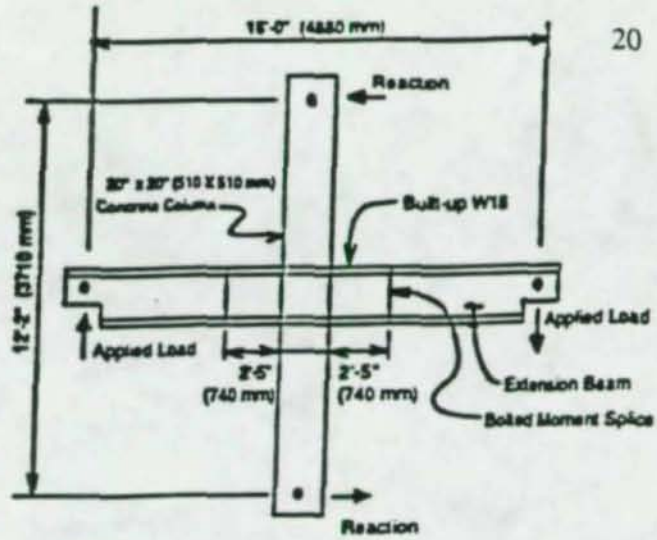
Typical test specimen and reinforcing steel detail used by Sheikh<sup>(22)</sup>
